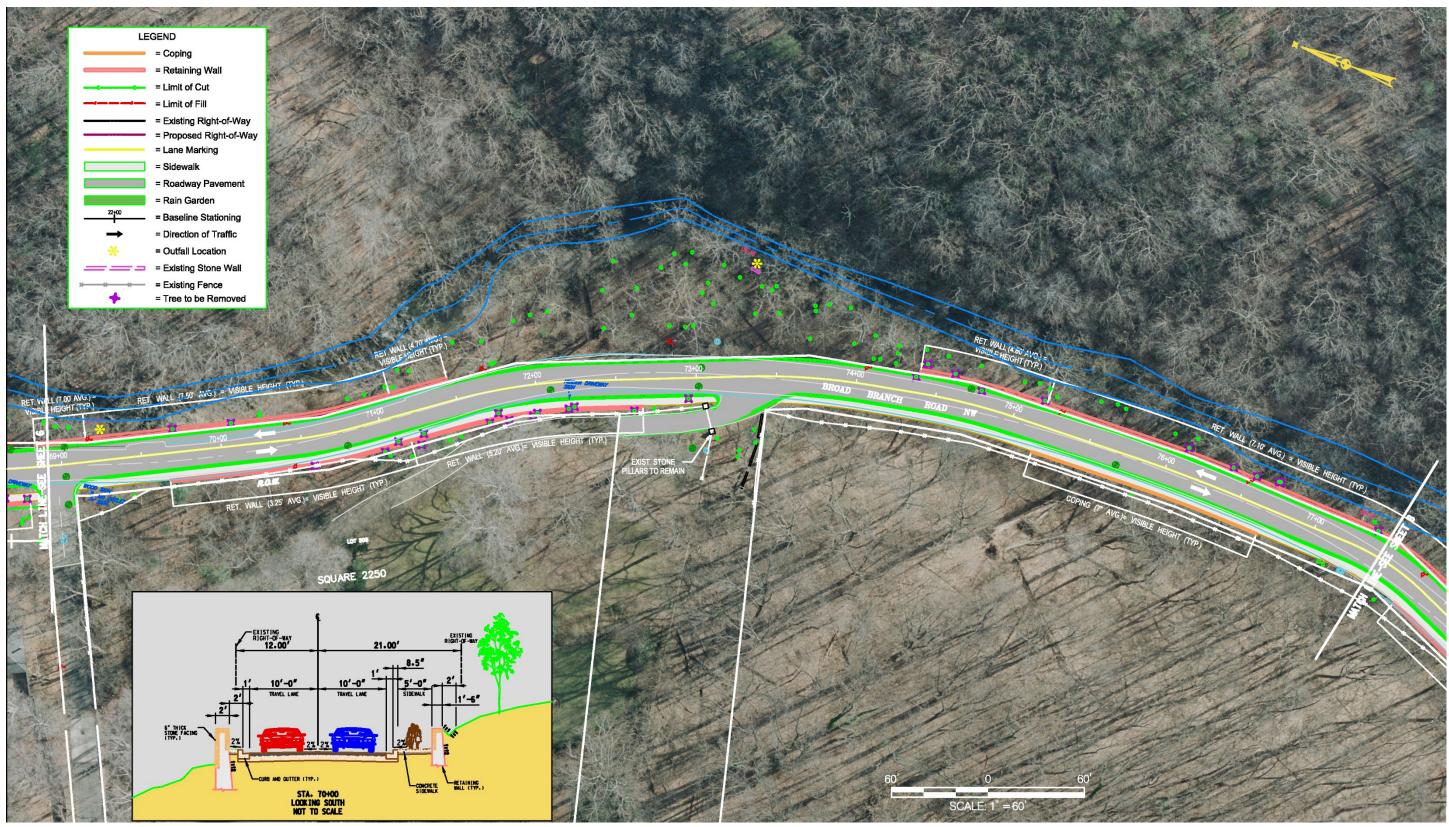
Alternative 3 Modified (Sheet 7 of 9)
